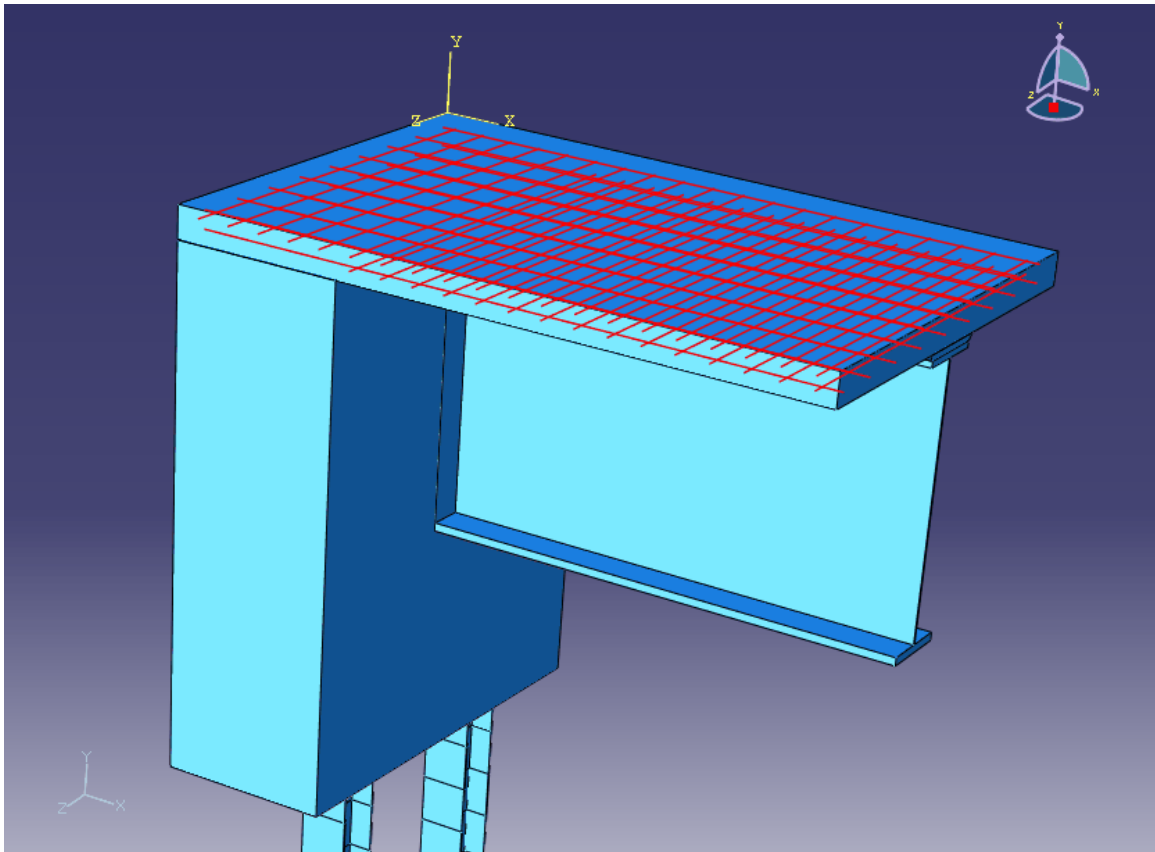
Highlighted Rebars of the Deck Slab
